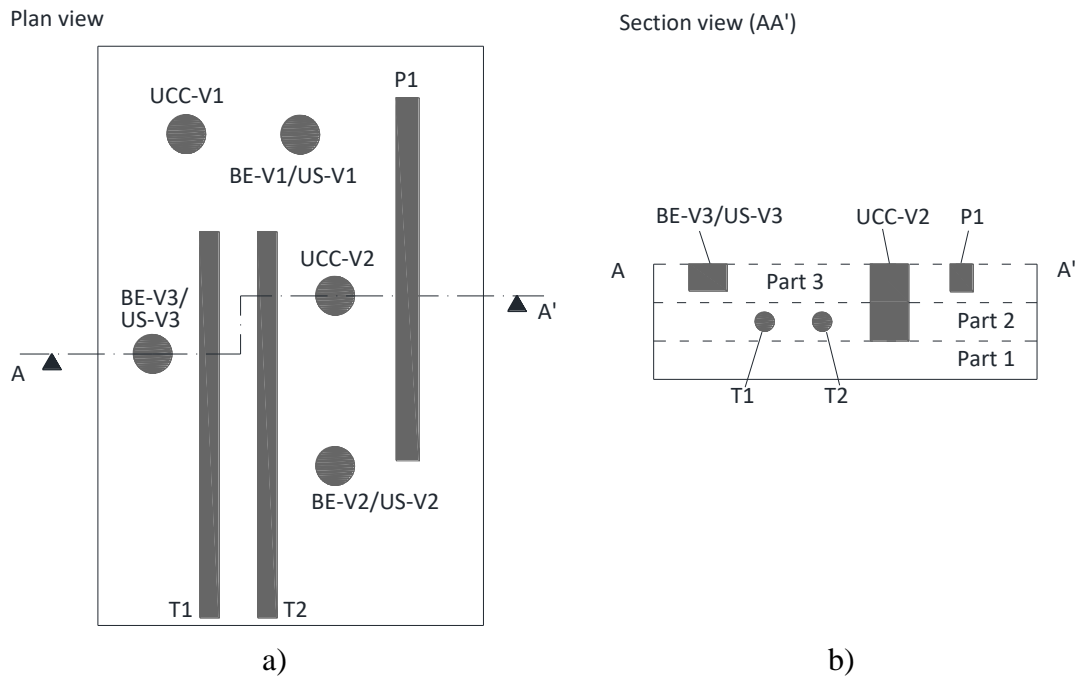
Layout of specimen collection: a) plan view; b) section A-A' view
